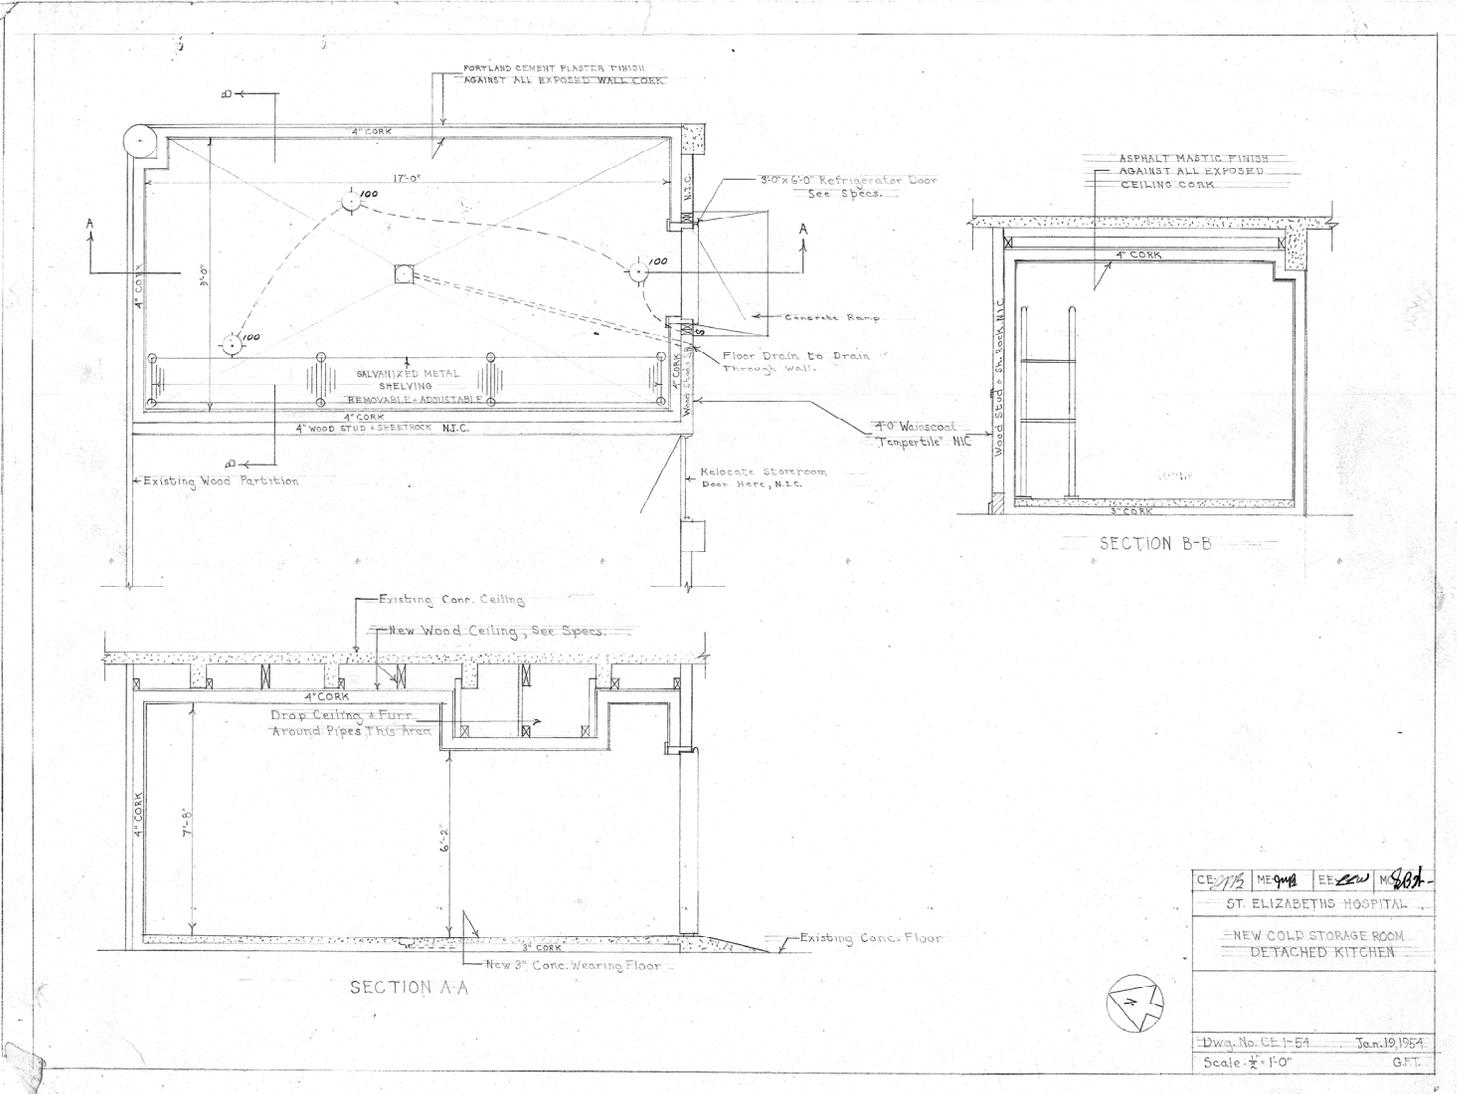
1954 construction drawing for the cold storage room at the basement level. Source: GSA archive, image DC1453SE0104.
